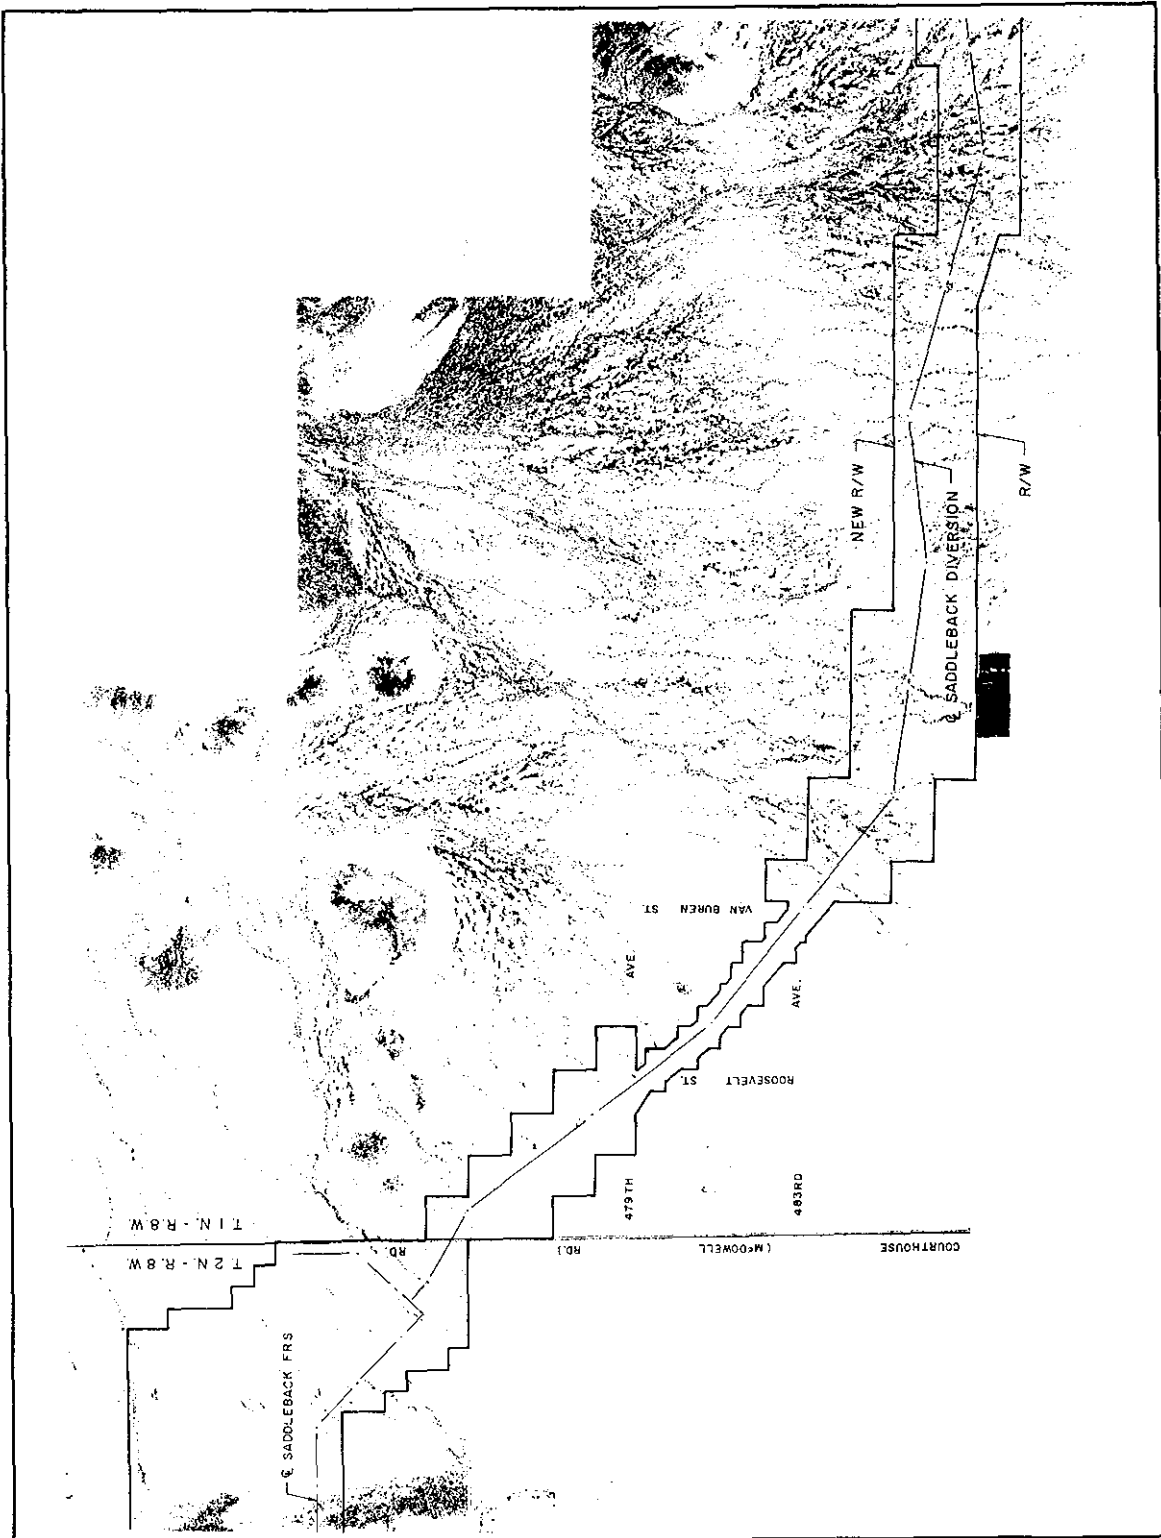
Site Photograph Showing Diversion Location Across the Fan
